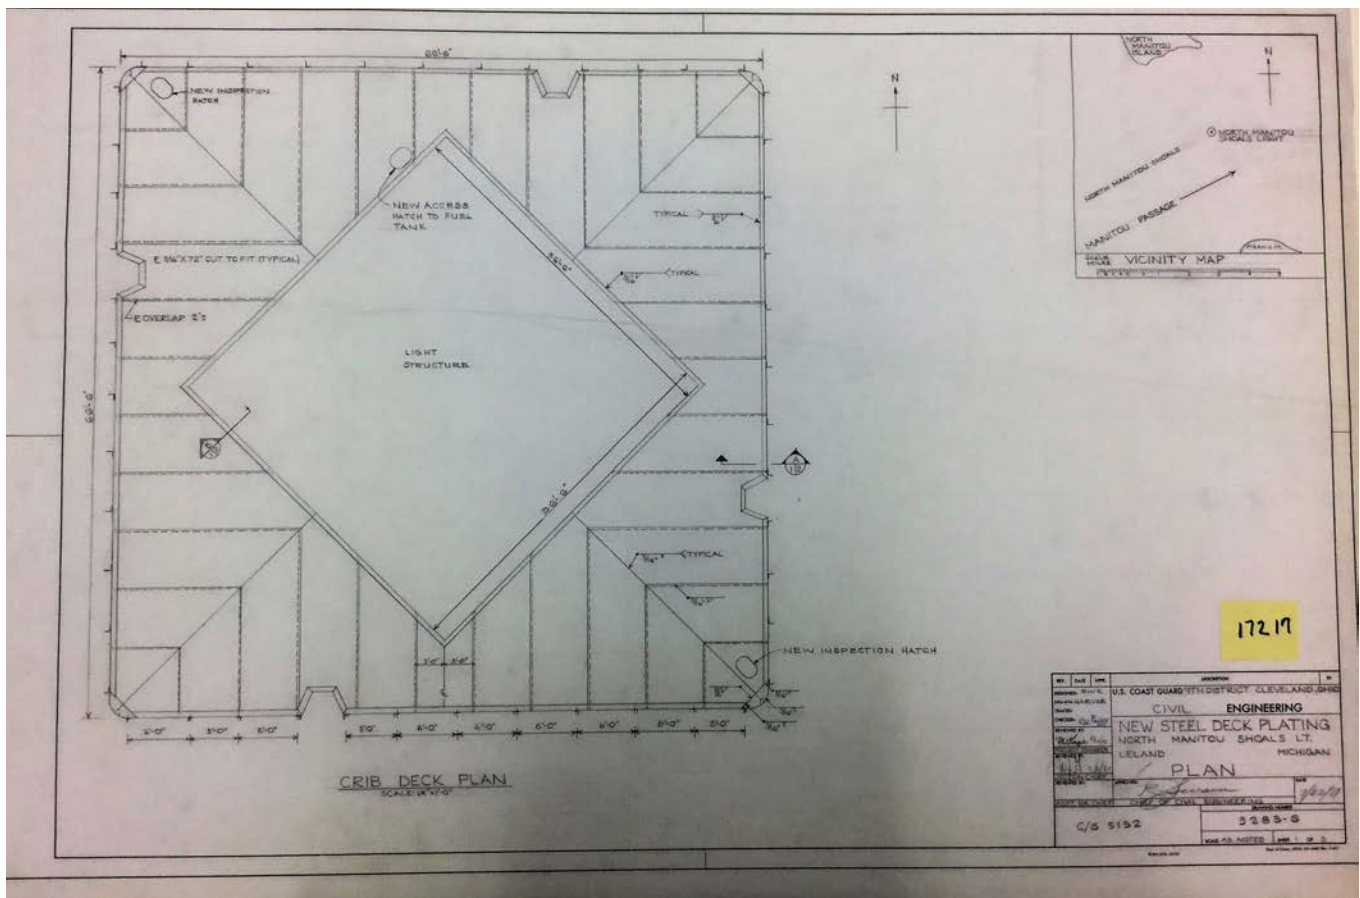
B-73: 1980s drawings for installation of steel plates on the pier deck.
